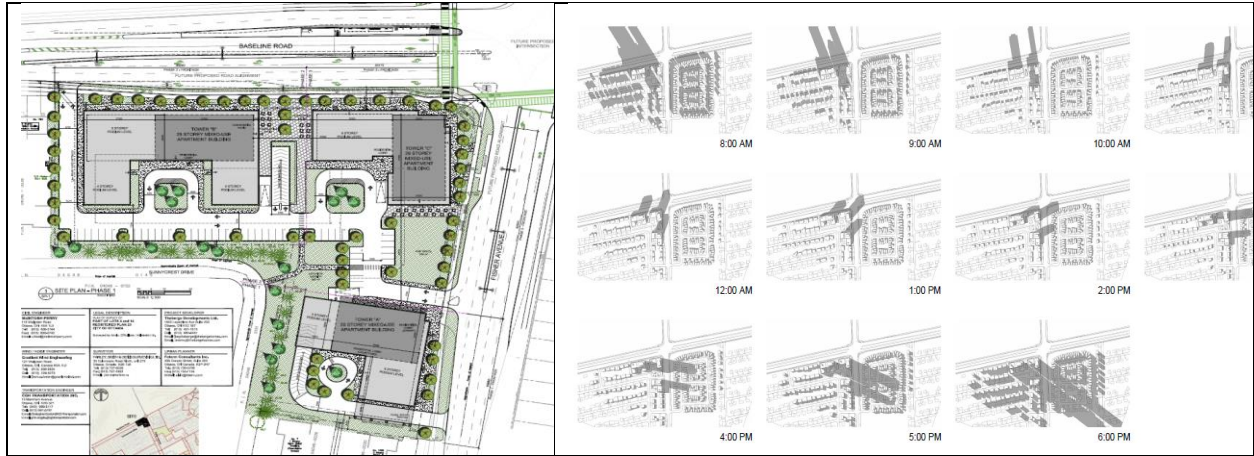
Site Plan and September Solstice Shadow Study illustrating the shadow cast by the three towers with 6 storey podiums and two slab towers along Baseline. Source: Zoning Amendment dated 2022 05 16. Rod Lahey Architects Inc. 2022
